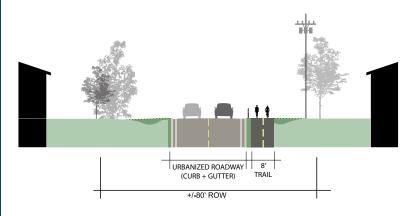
Proposed Trail on Manitowoc Road (south side shown; to be determined which side of roadway in final design)
